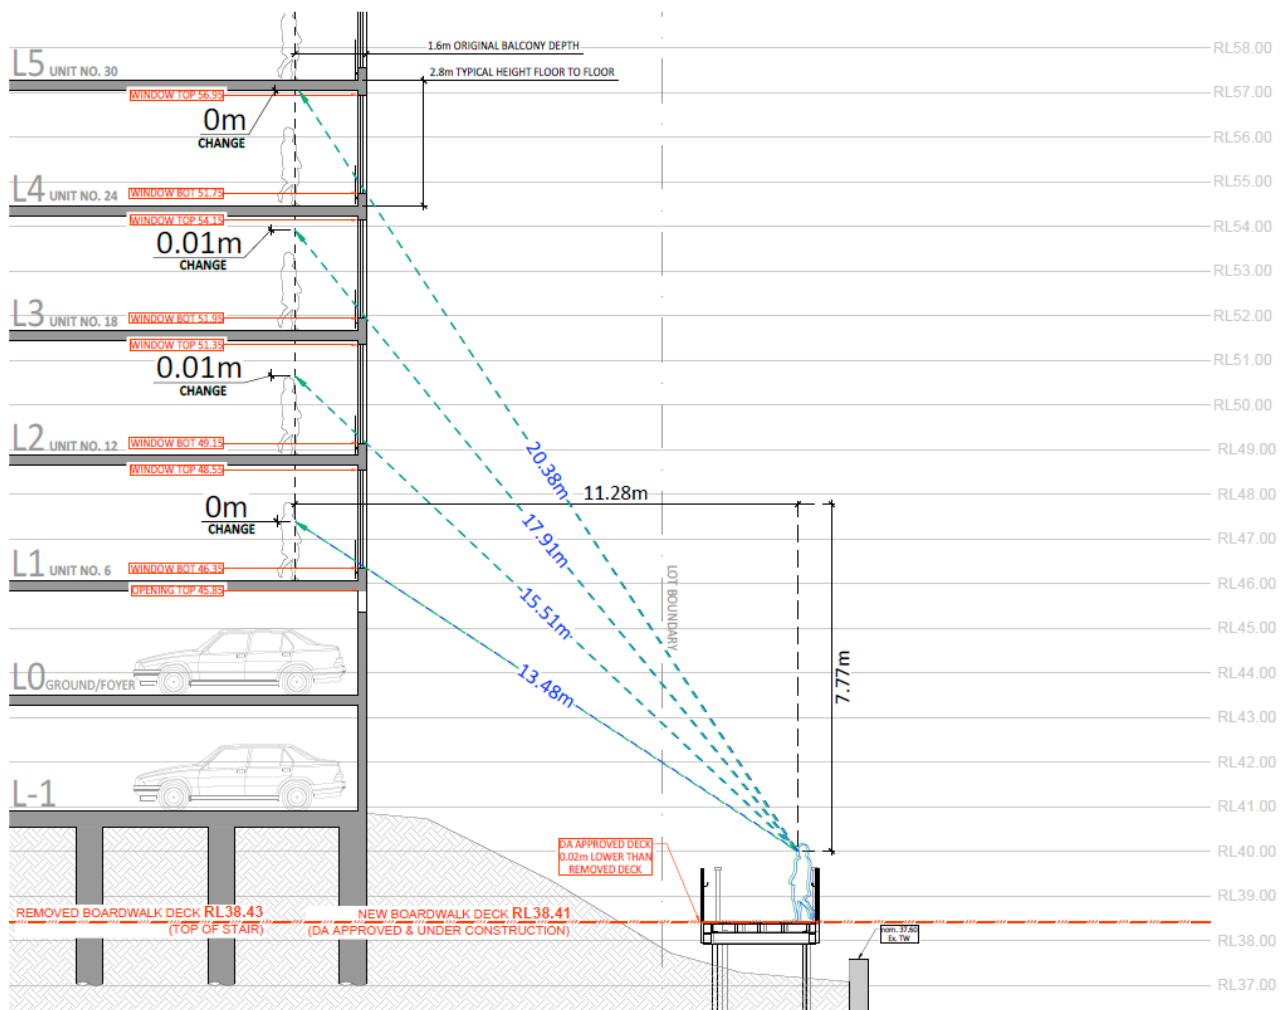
Cross section detail 01 from drawing SK.01 (refer Attachment 1).
